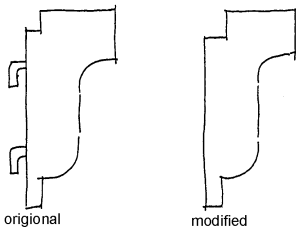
Platform roof HS Station Den Haag. Original attachment of the brackets by hooks and modified attachment with bolts.
